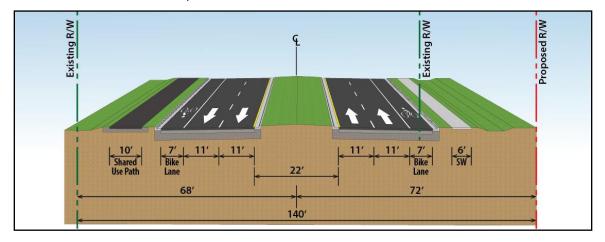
Proposed Roadway Typical Section 2 from North of Townsend Road to Cindy Lane
